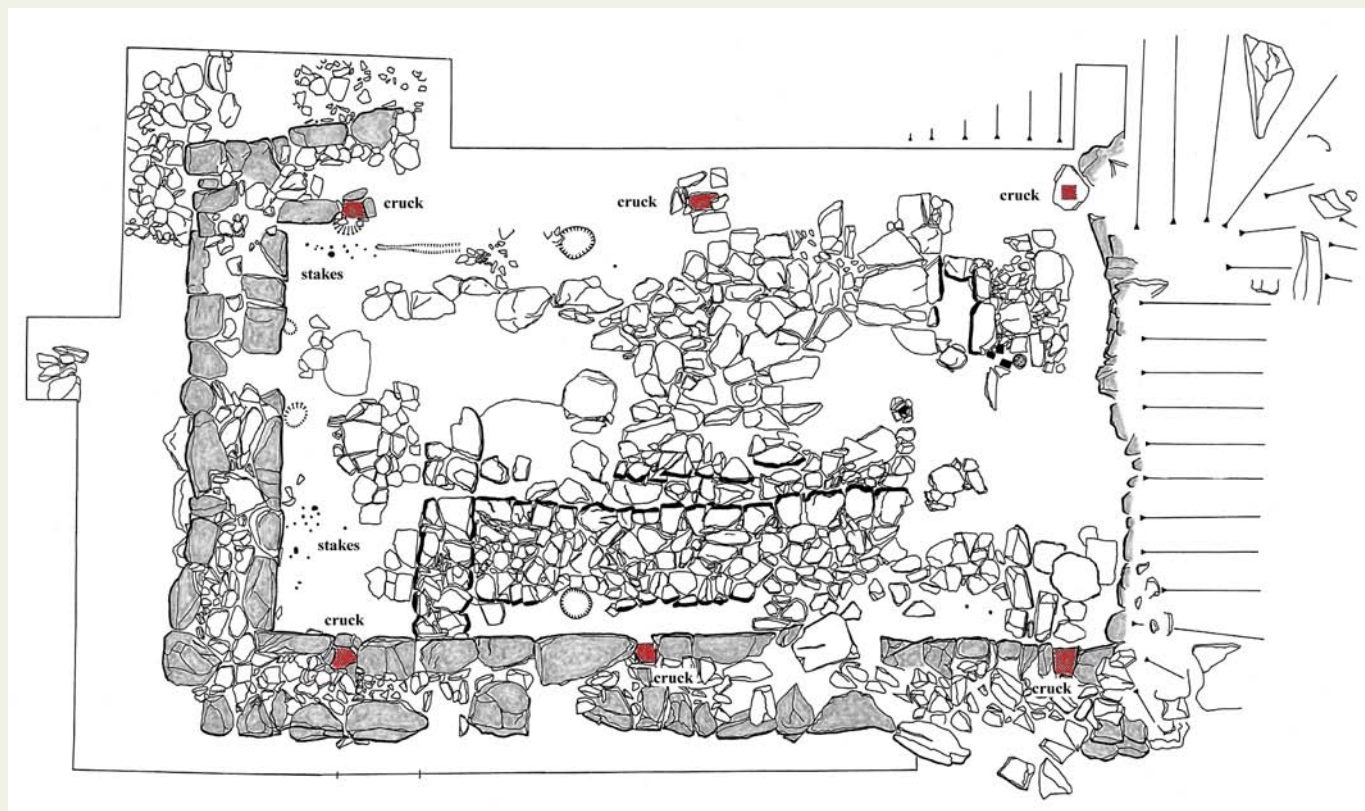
Plan of building at Glenochar fermtoun showing cruck positions and stakes
